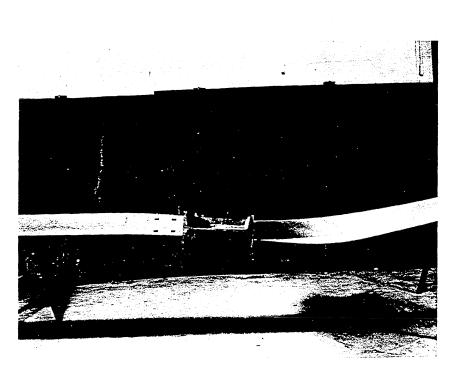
b. Plan View of Specimen 60 S 6 I 12.5
